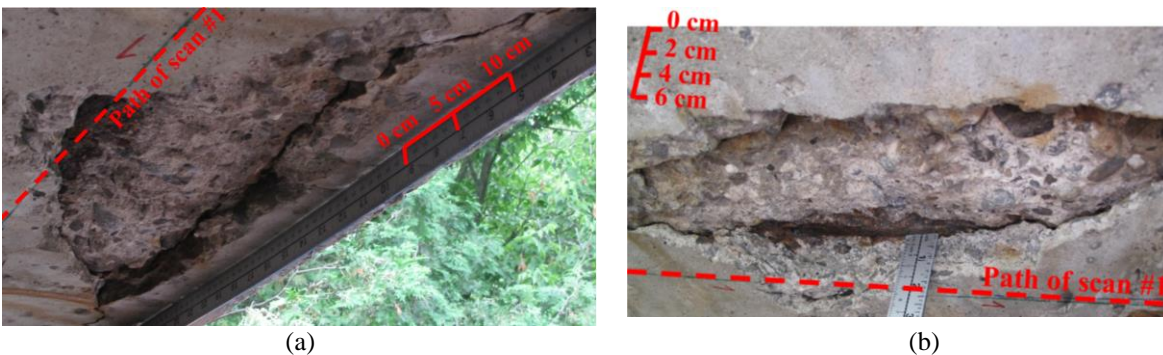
Most-severe concrete spalling in the undersurface of culvert deck (at approximately 240 cm to 300 cm from West wall, in scan #1): (a) Spalling extension, (b) Spalling depth.
